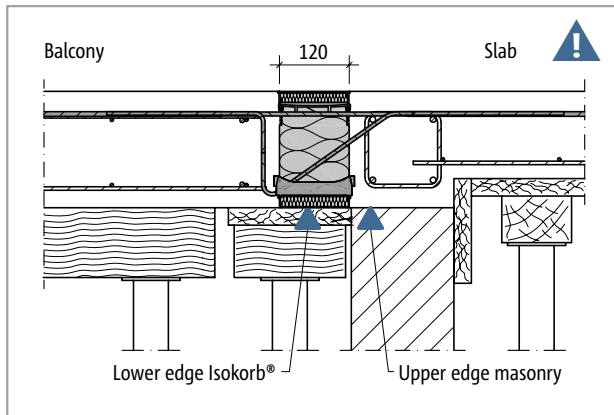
Schöck Isokorb® XT type K: In-situ concrete balcony with height offset floor on masonry wall
